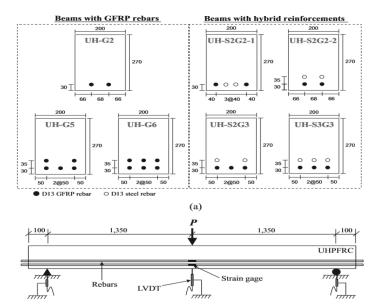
Details of test beams and test setup performed by the authors [4]
